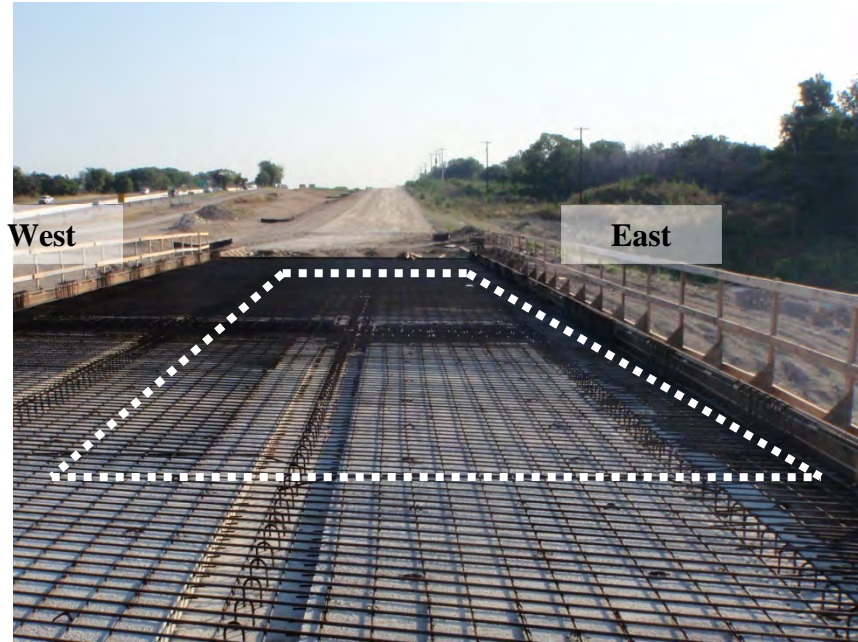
Test area for reduced deformed-bar reinforcement, Lampasas River Bridge
